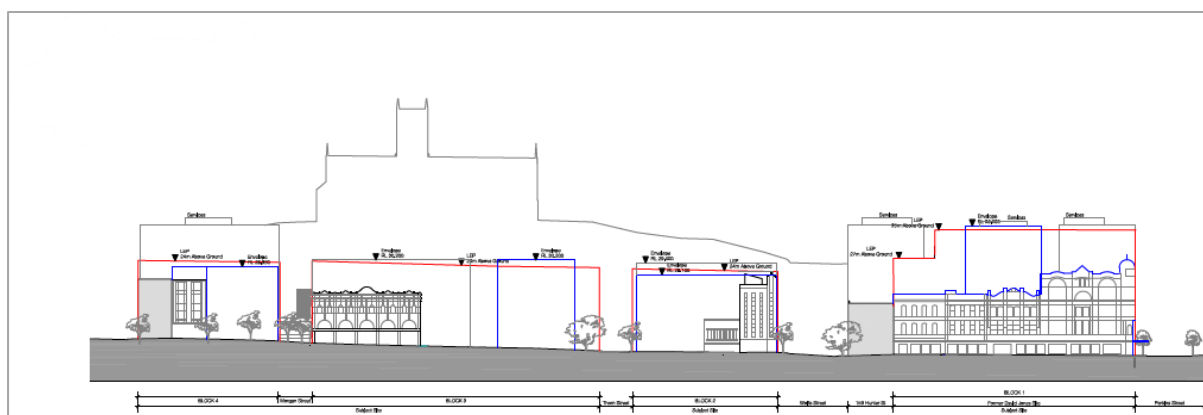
Excerpt of approved building envelopes per DA2017/00701, Hunter Street elevation. Source: SJB
